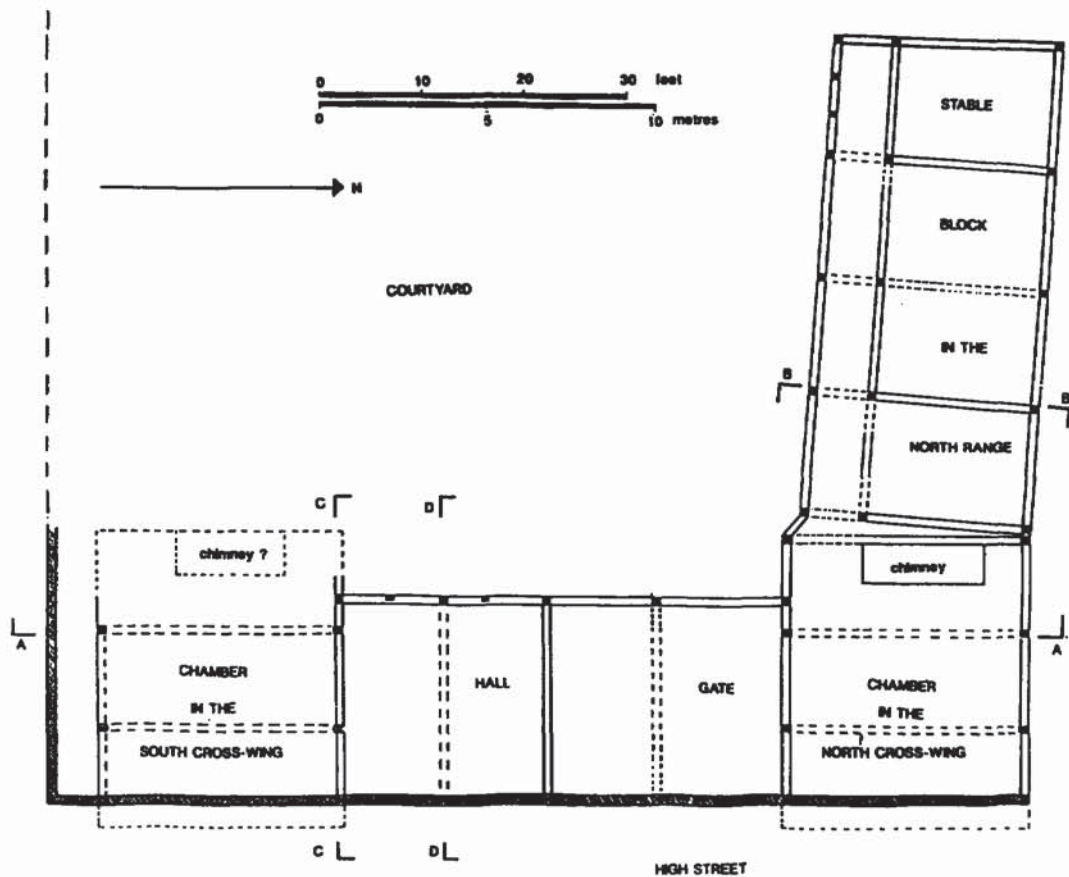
A plan of The Angel Inn at first floor level. (Brick walls are represented by hatching)
